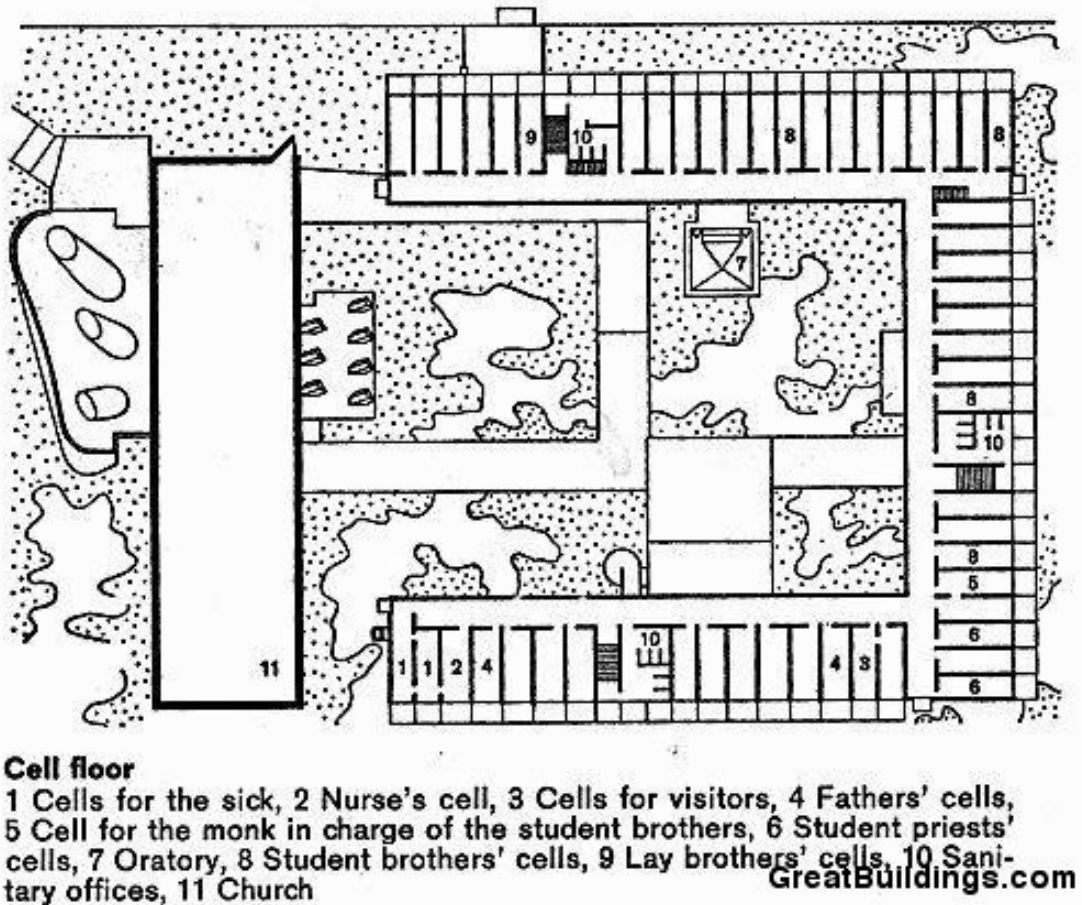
, Floor plan showing the long, narrow sleeping rooms. (Source: ArchDaily)
